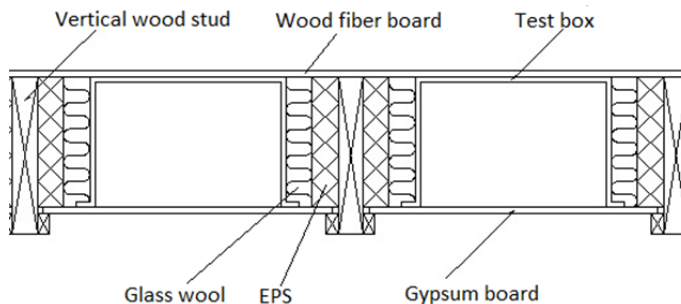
Horizontal section through two of the test boxes installed in the wall.
